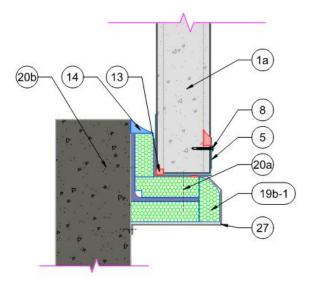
Base detail to wrapped steel angle – vertical and horizontal panel
